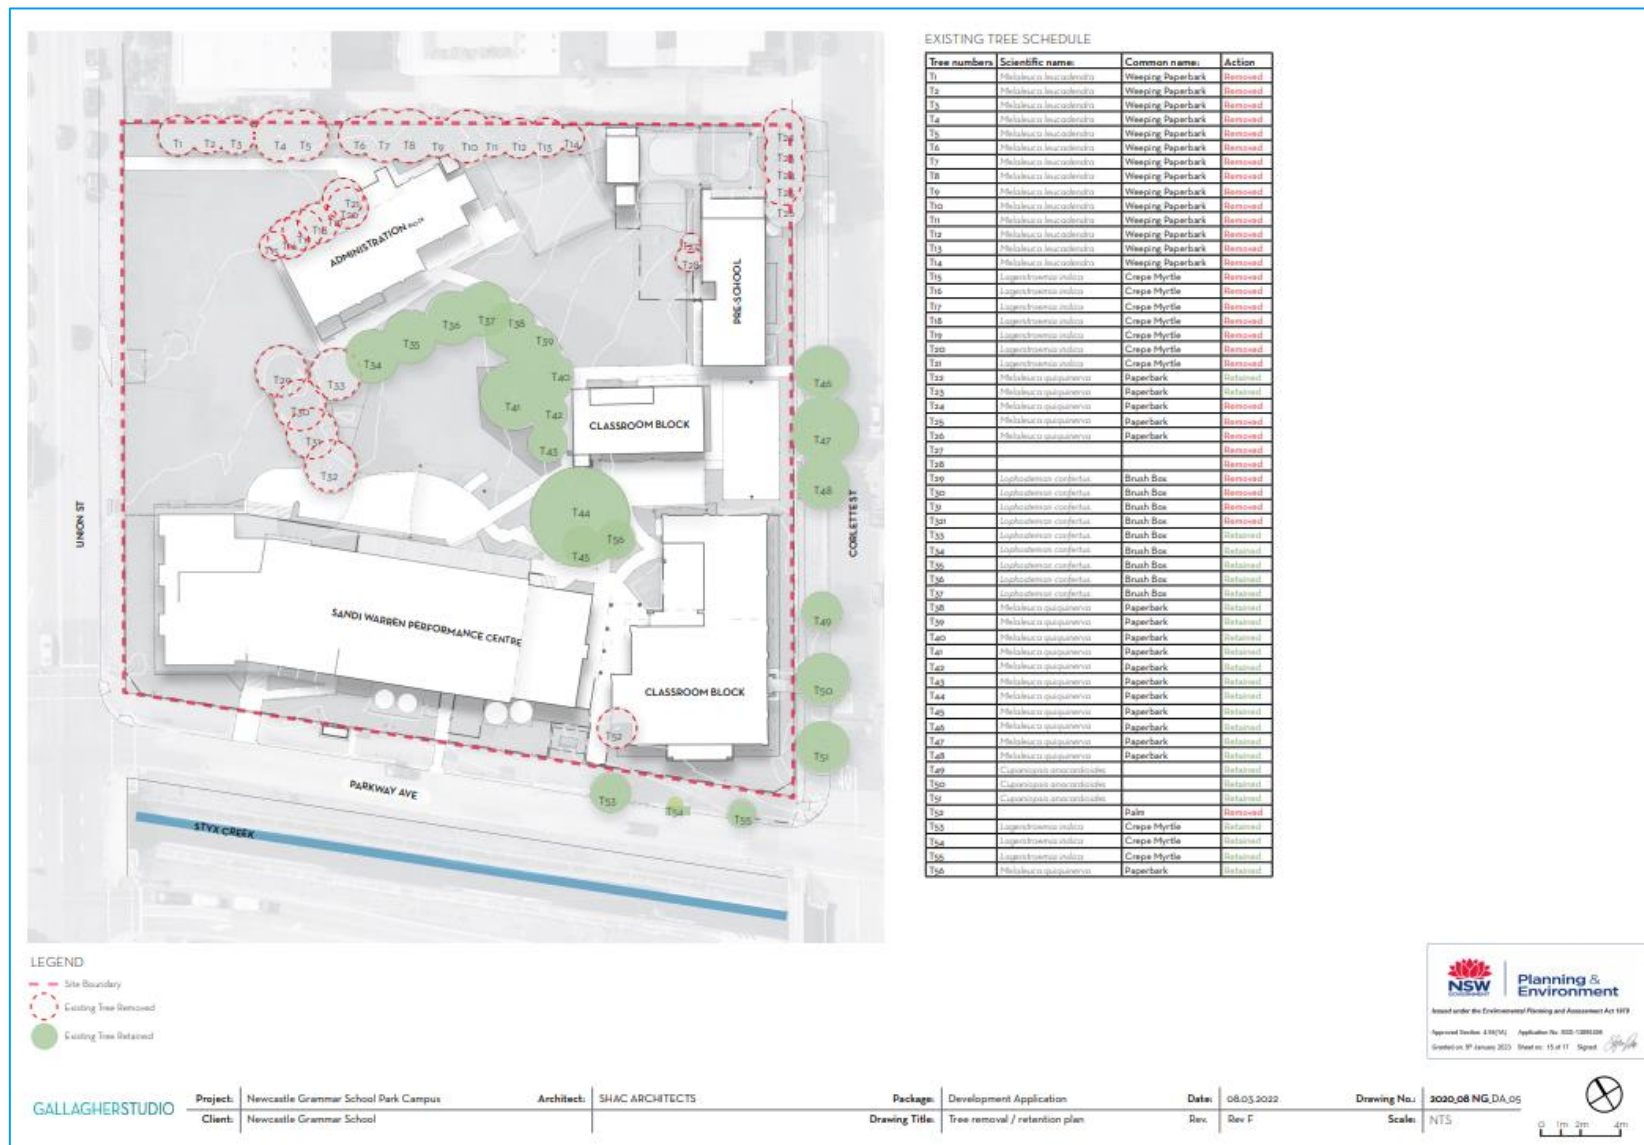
Landscape Plan (Drawing No. 2020_08 NG_DA_05) by SHAC Architects
